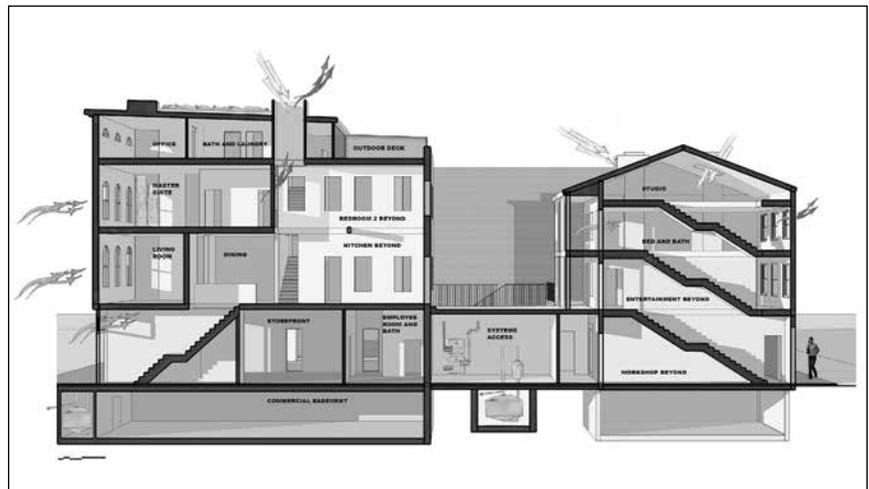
Section of 1700 Vine Street by student design team members John Hoebbel, Sean Lyons, Elizabeth Schultz, and Sarah White, showing the exploitation of the building's existing ventilation and skylighting shafts and the problematic interior stair proposed for the rear outbuilding.
